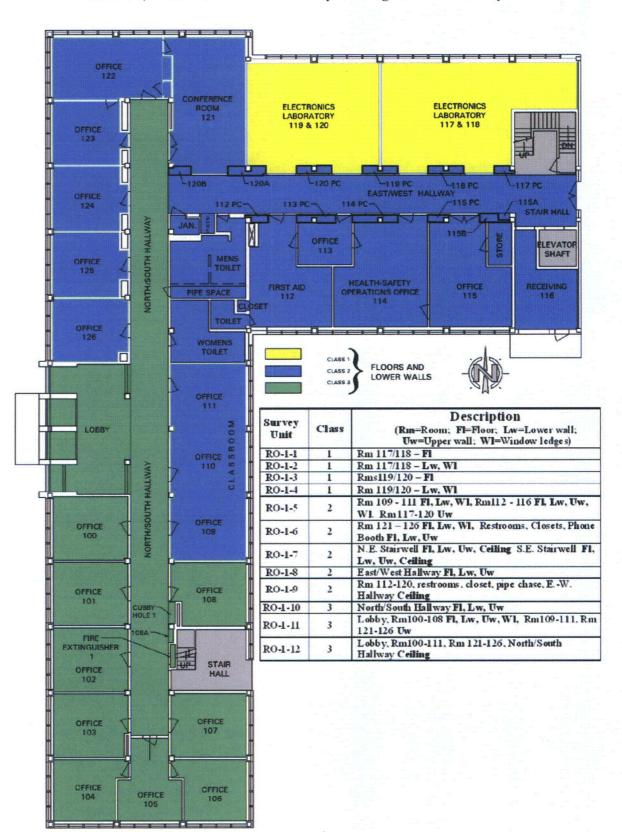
, Reactor Office and laboratory Building First Floor Survey Units
